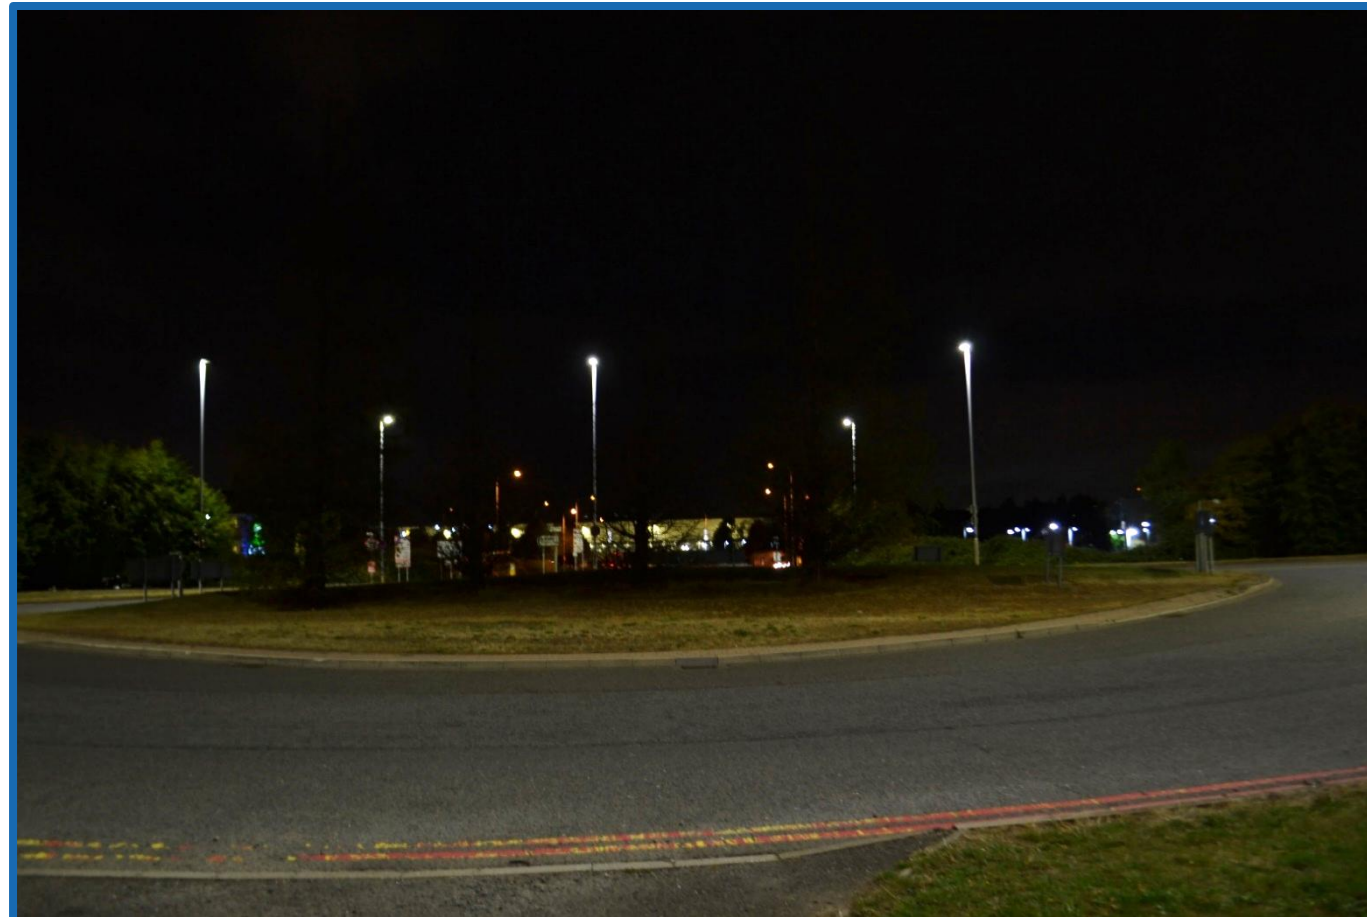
View of the A2453 Hunter Road Roundabout facing north
